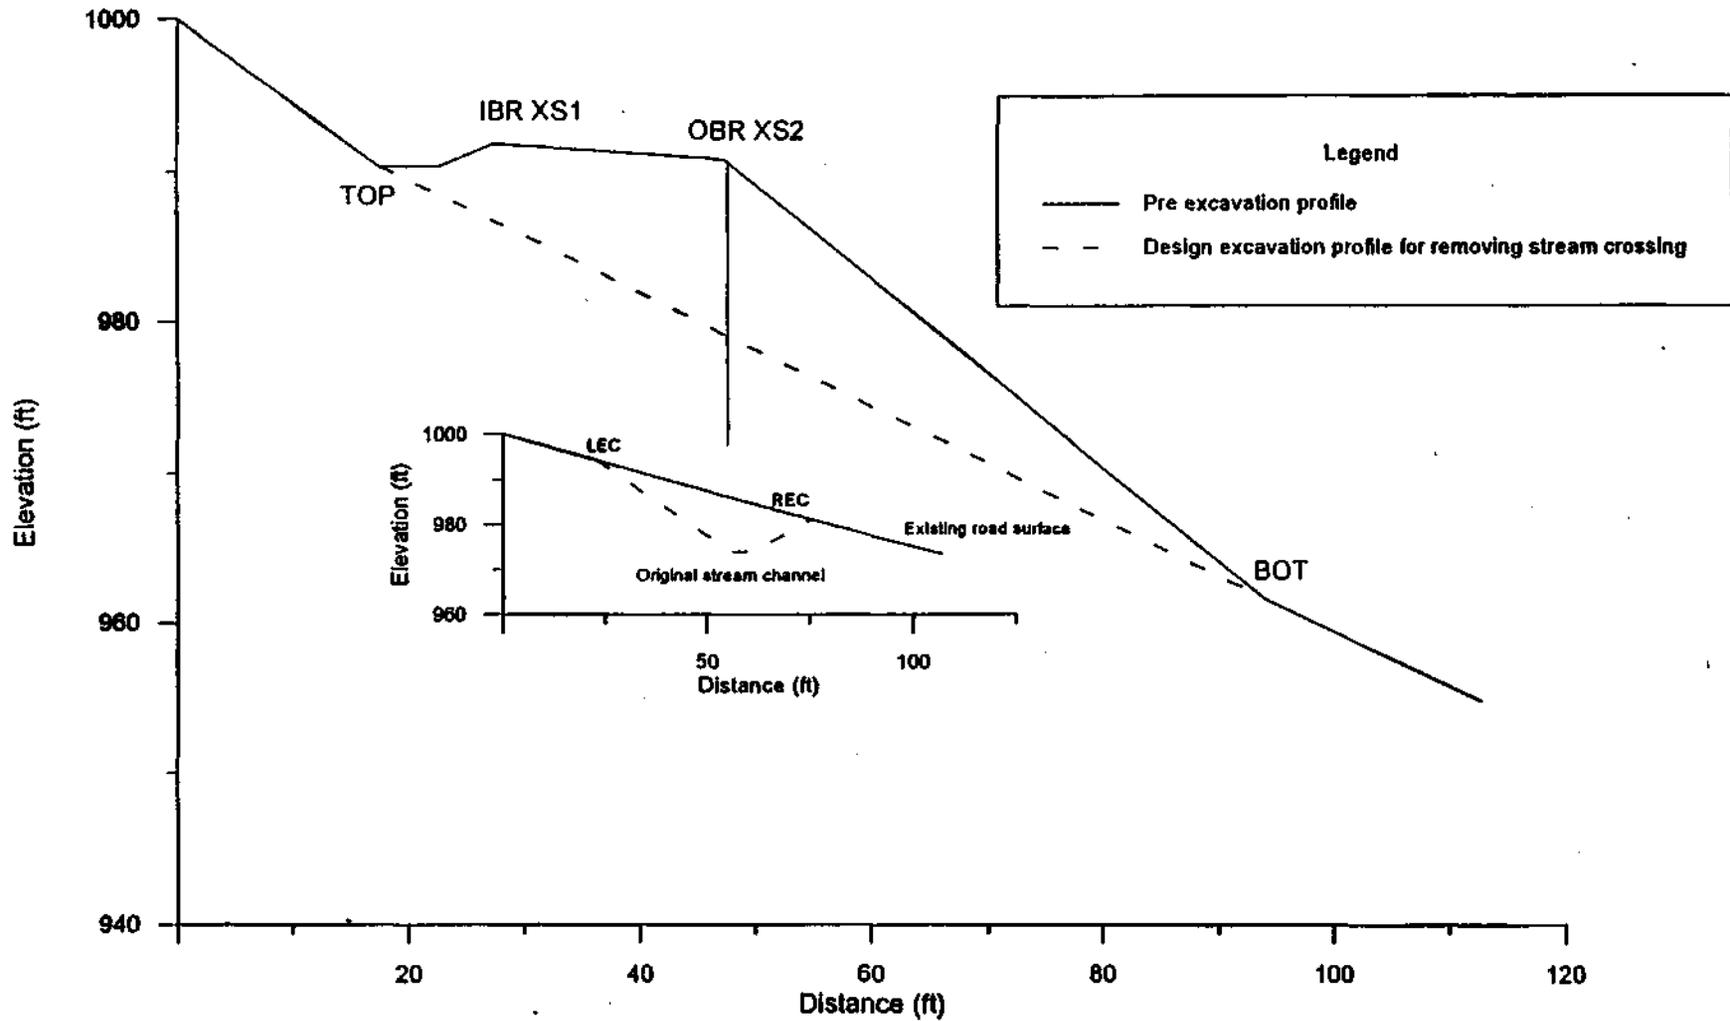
Ashton Road: Site 3A Stream Crossing Pre & Design Excavation Profiles.
